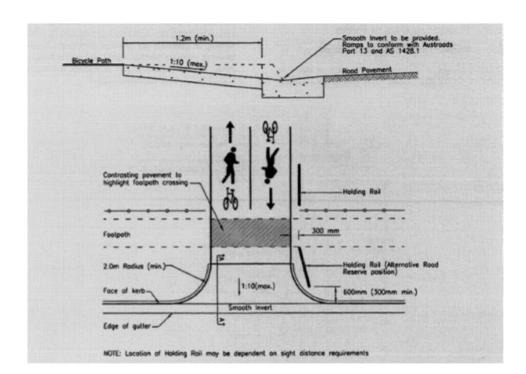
Kerb Ramp & Holding Rail Layout Details
